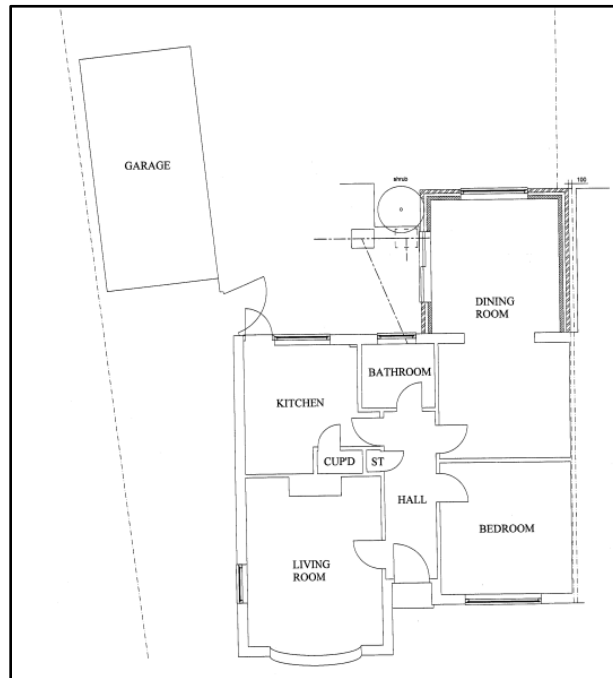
Approved floor plan under Planning Permission Ref. Y05/1008/SH
